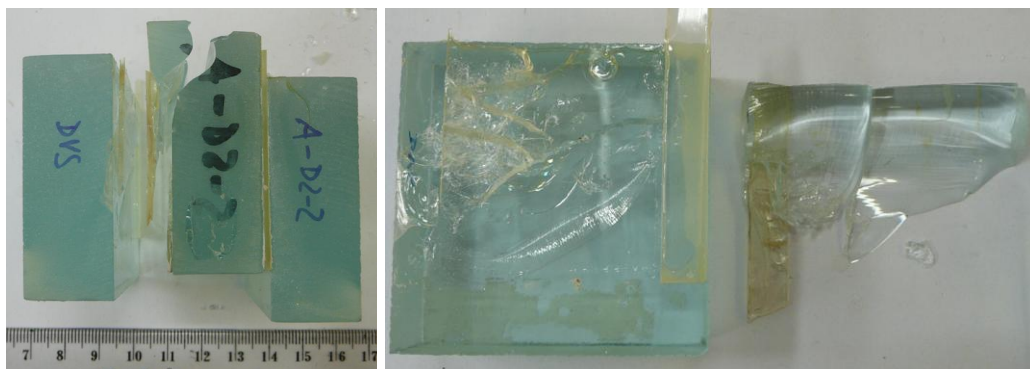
Specimen with epoxy adhesive exposed to artificial ageing after shear test - substrate failure
